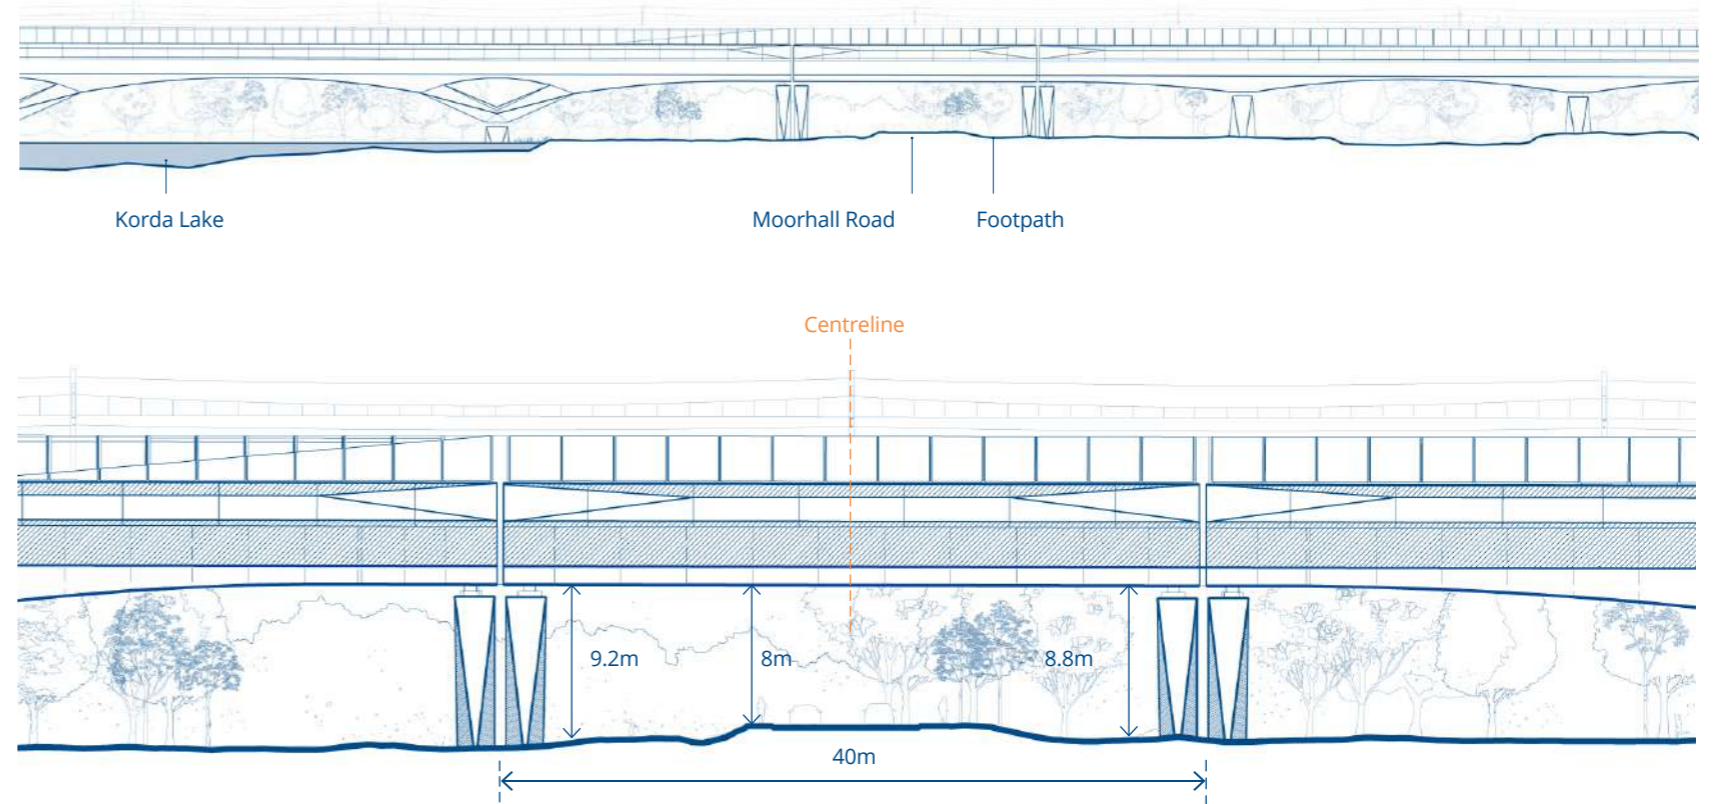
\_ Proposed south elevations - Moorhall Road crossing
